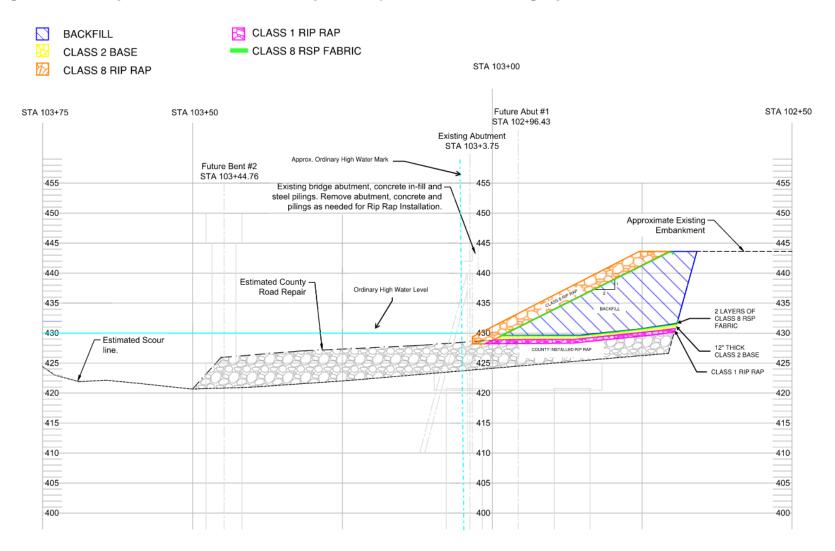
Proposed Repairs Elevation Schematics of Rip-Rap Protections
